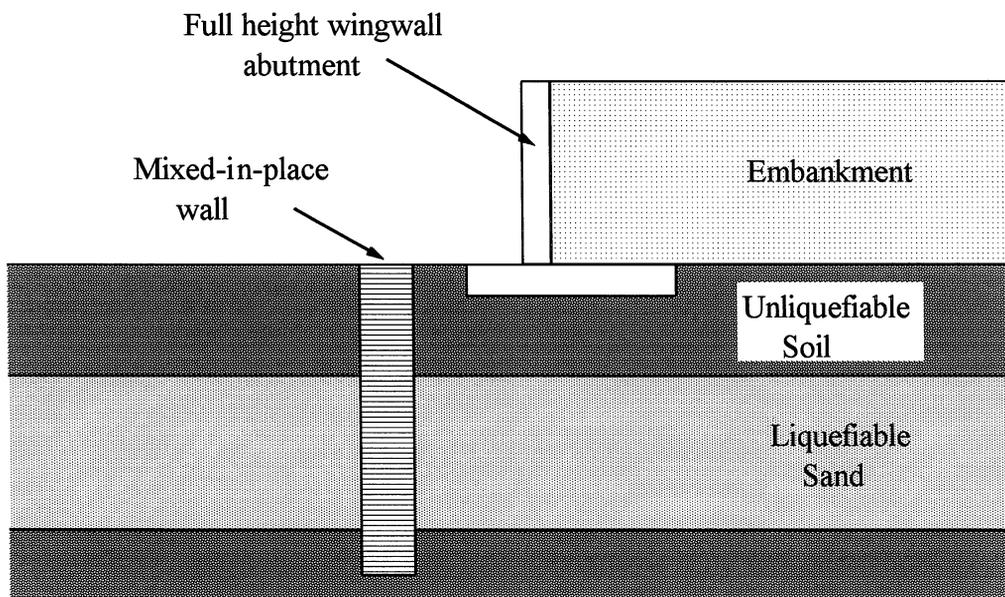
Section Showing Mixed-in-Place Wall in Front of Full-Height Wingwall Abutment
